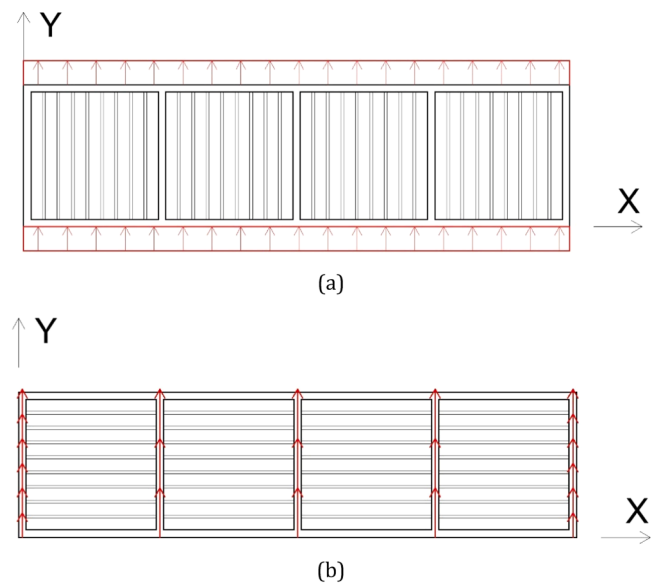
One-story 1×4 structures, with joists (a) parallel to and (b) orthogonal to the loading direction.
